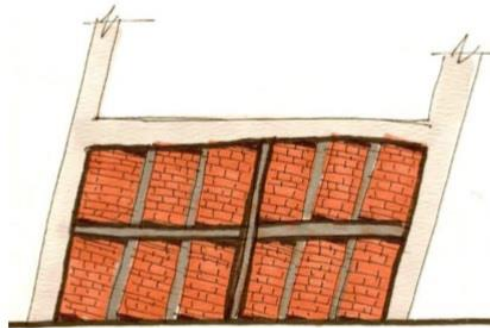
Armature cross-wall concept showing the details of panels in wall.
